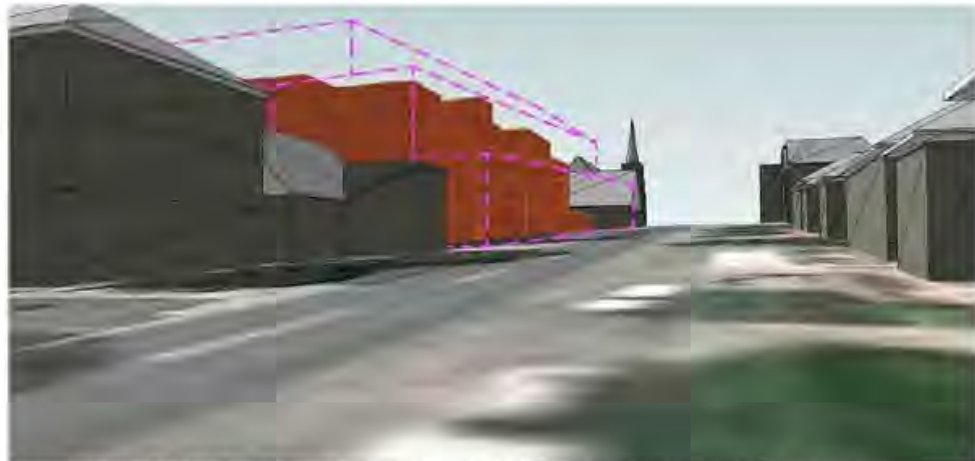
existing built form with proposed building envelope comparison (Marion Street looking east).
